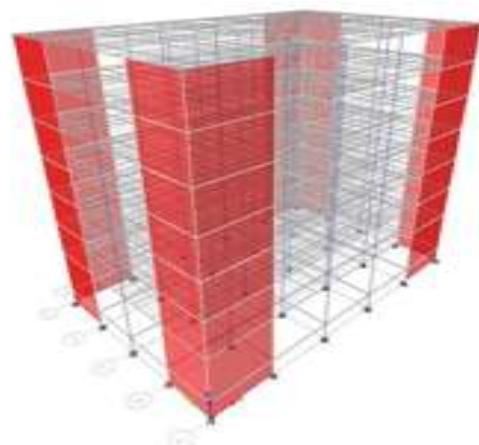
3D VIEW- FLAT SLAB WITH L-SHAPED SHEAR WALL
